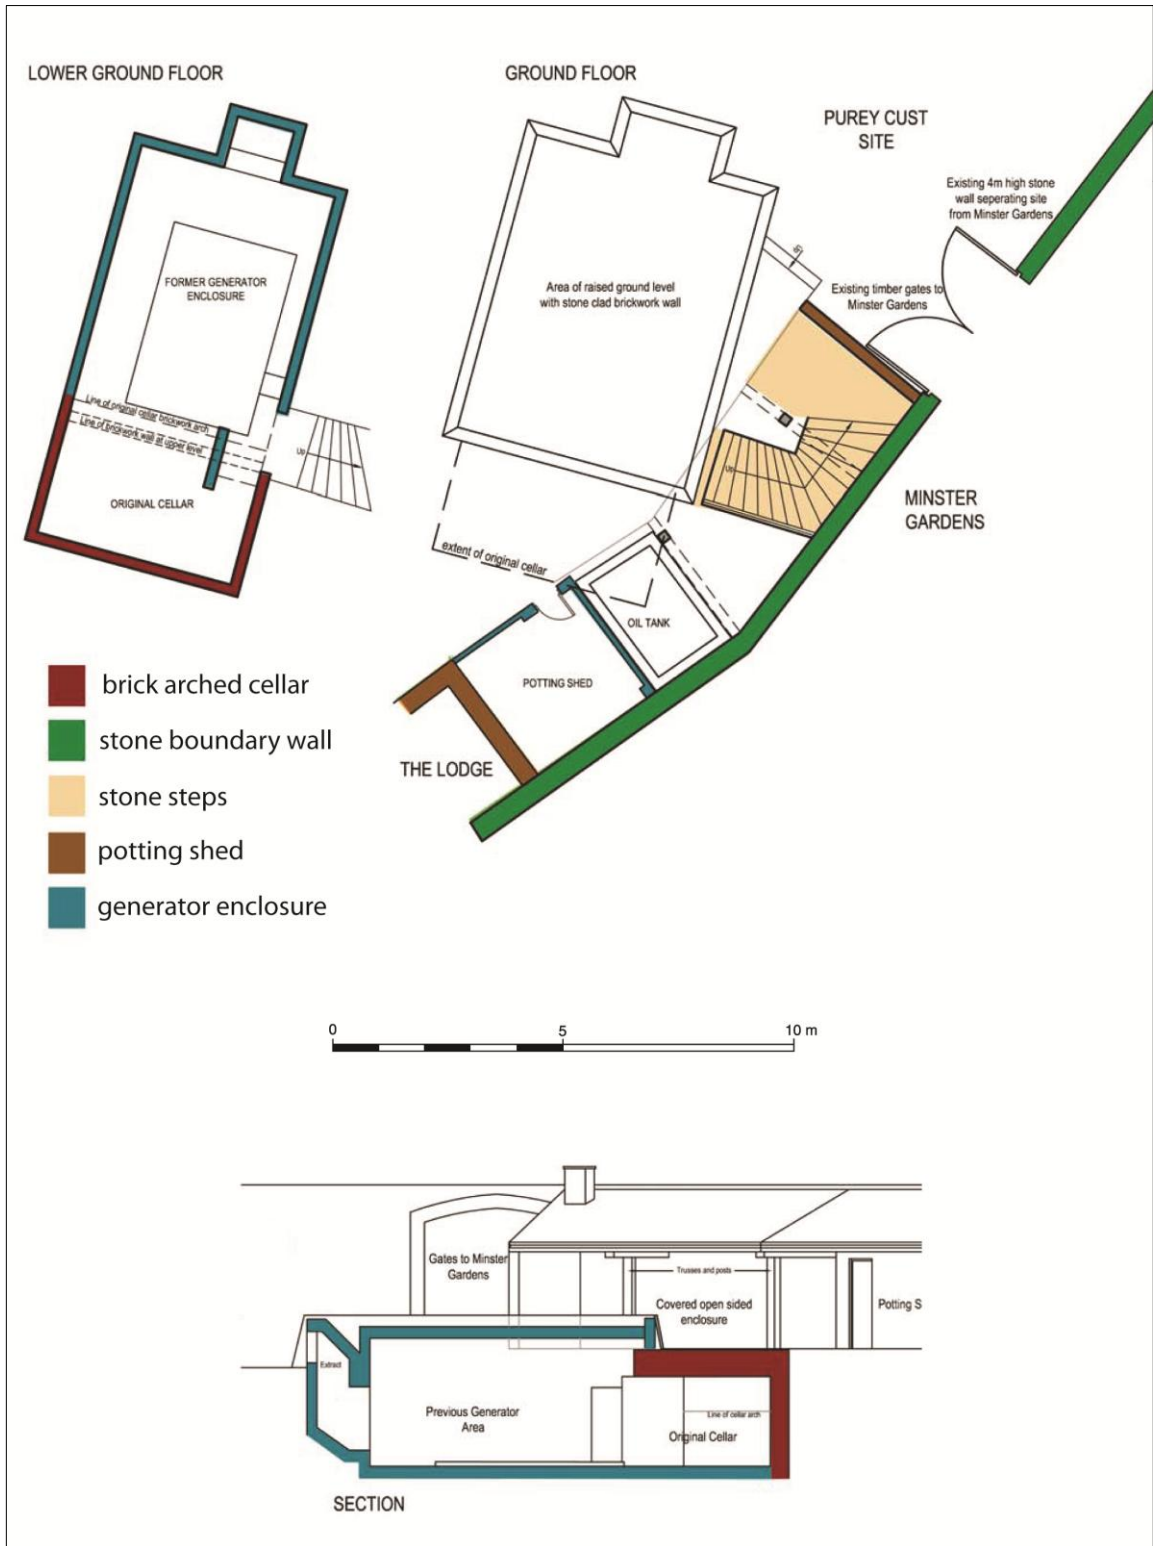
Plans and section of existing structural arrangement at site with individual elements colour coded
